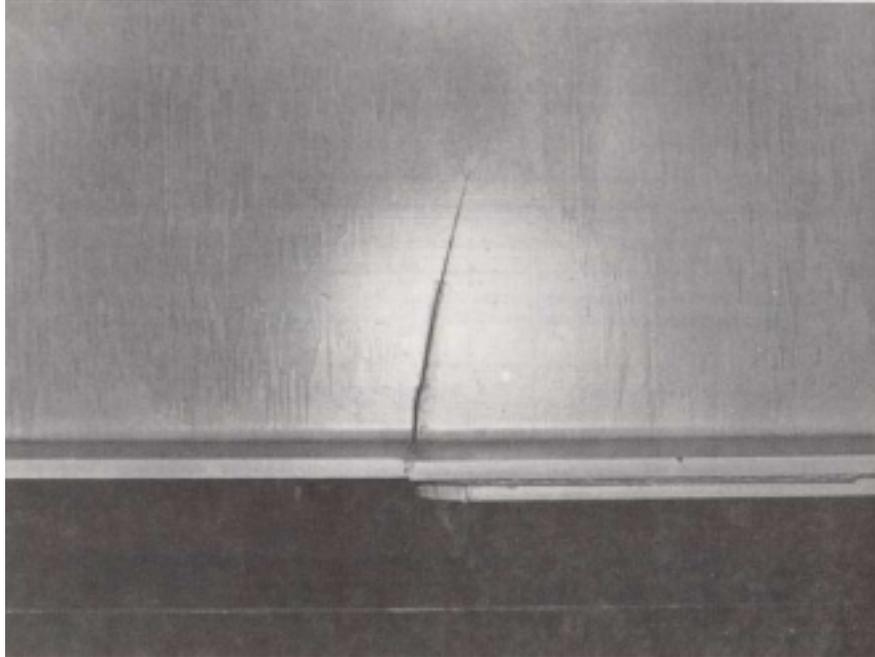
Fatigue Crack at Cover Plate Detail
